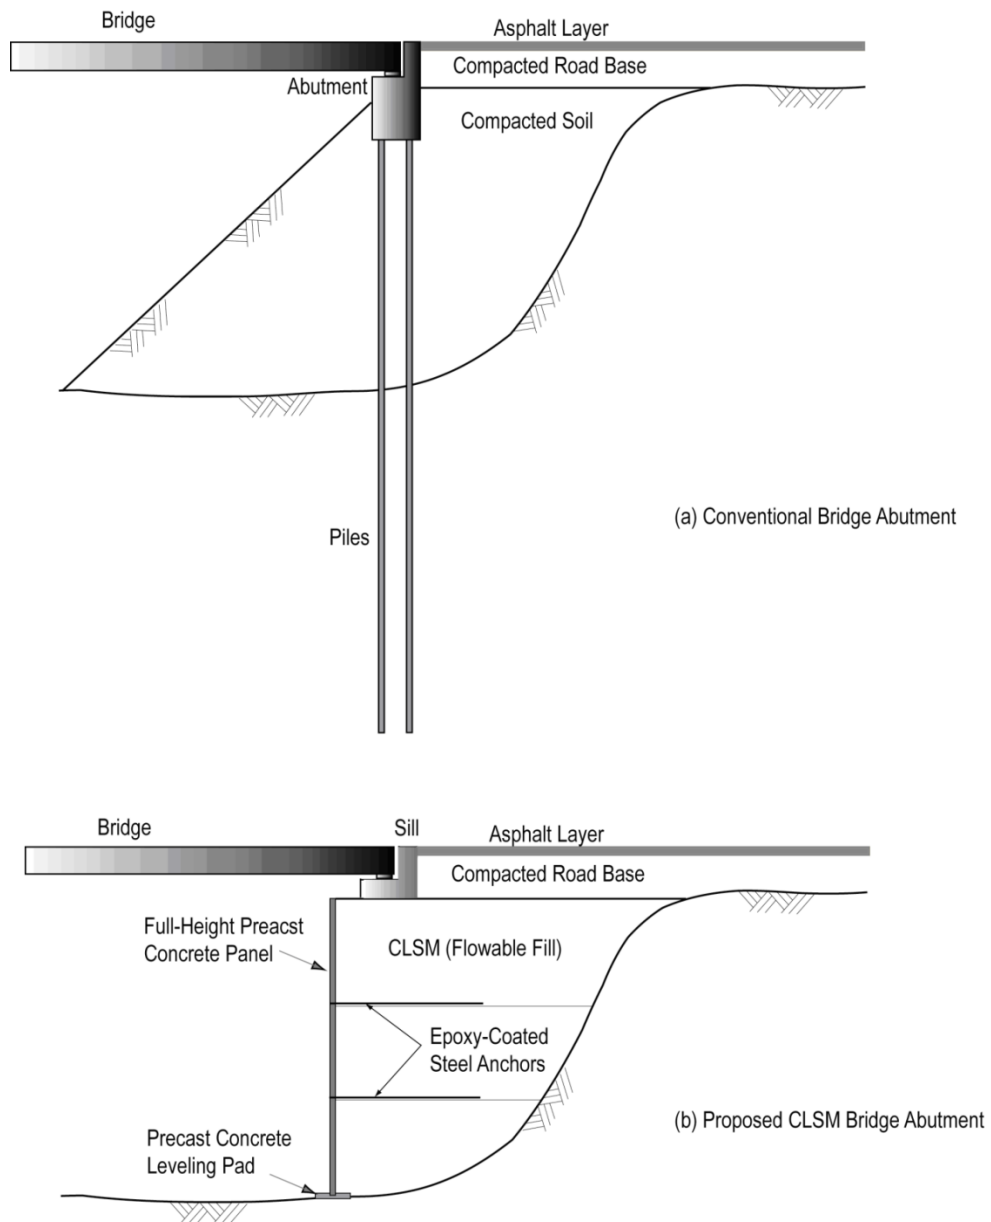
Comparison between (a) Conventional bridge abutment and (b) Proposed CLSM bridge abutment.
